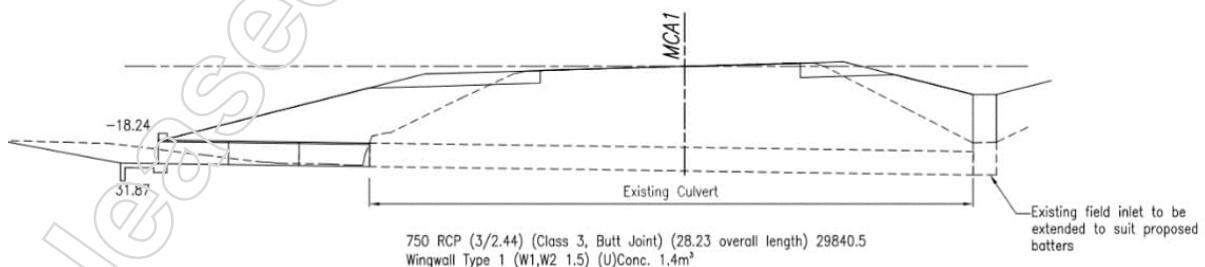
Existing CU2-29840 RCP culvert – A1-1 (upstream)
